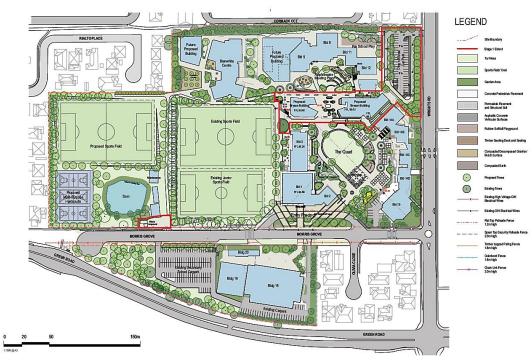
Extract from Stage 1 Landscape Ground Level plan (Source: Arterra)
